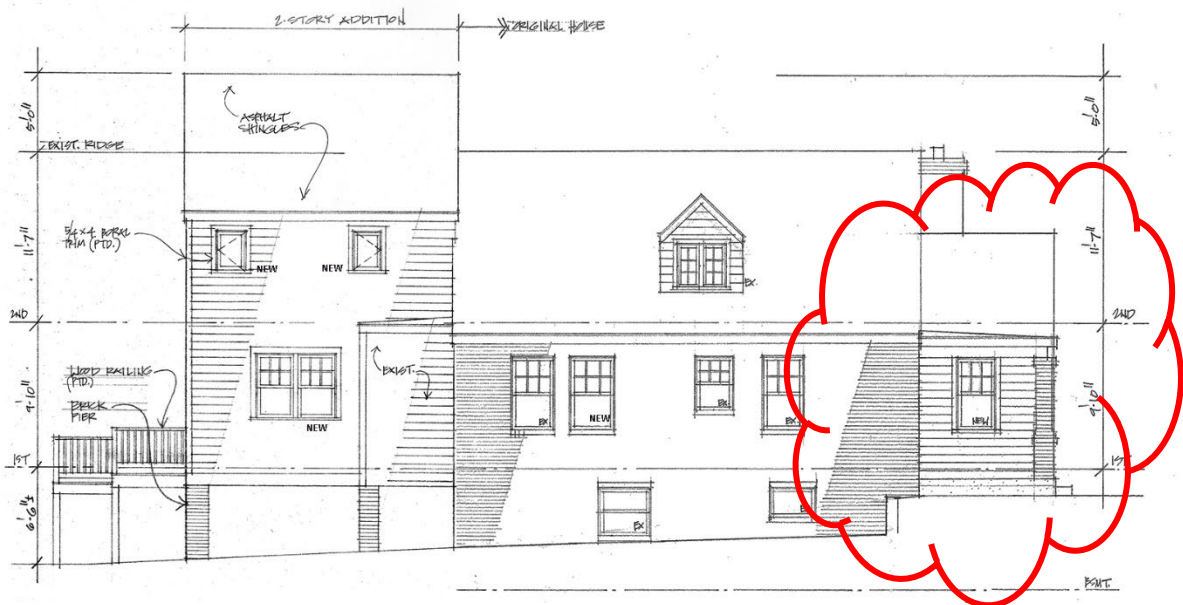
The proposed left-side elevation with the enclosed porch clouded.
